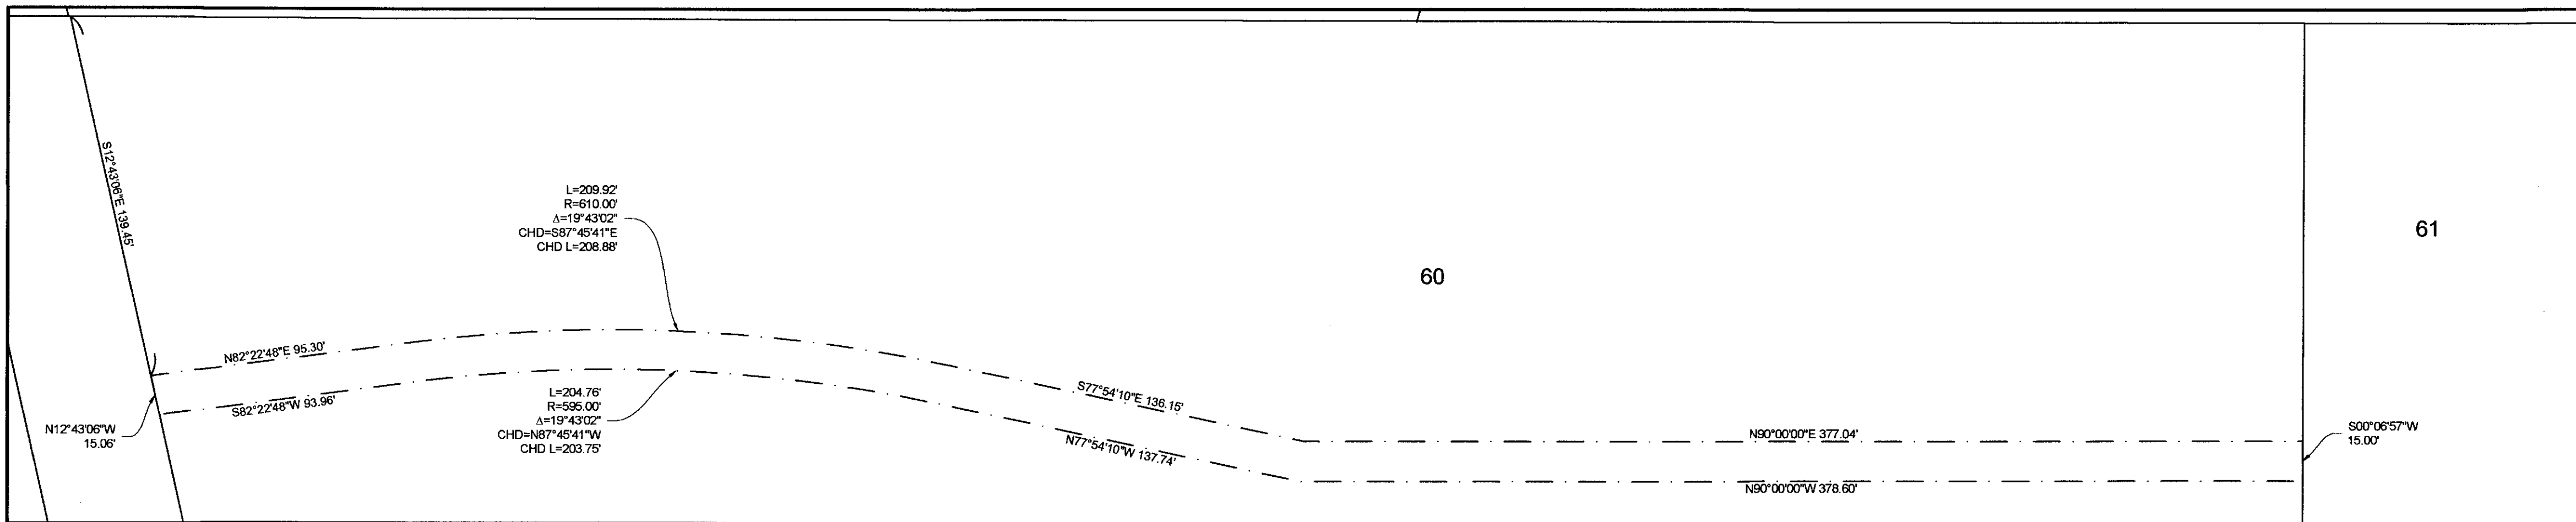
DETAIL Q: DRAINAGE & STORM SEWER EASEMENT
